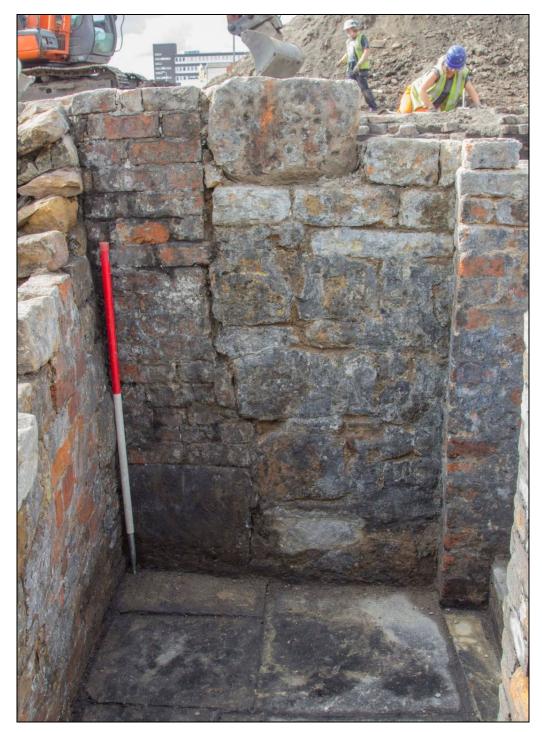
Wall 4028 of House 14 at the foot of the stairs showing an infill of bricks within stone wall 4028, looking west
